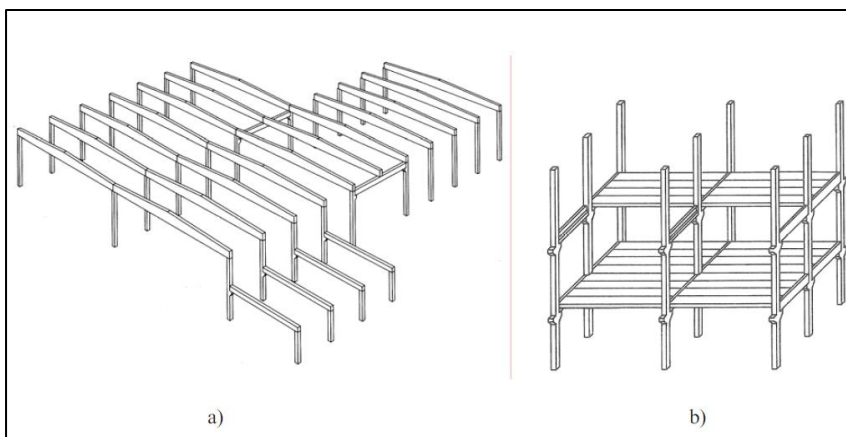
(a) illustrates a single storey structure beam and column system and Figure A.1 (b) illustrates a multi storey beam and column system.
